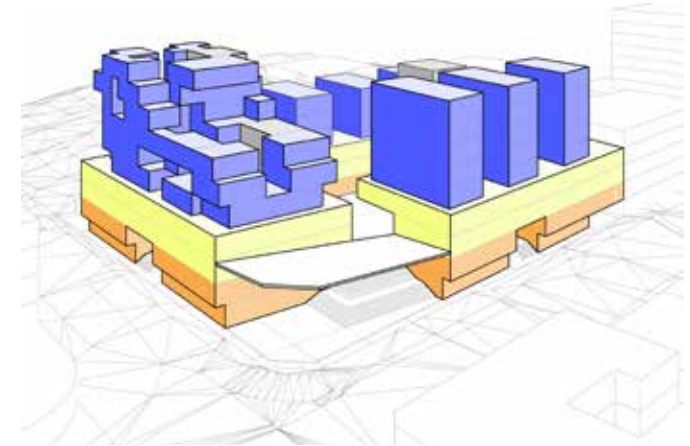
Units arrange around edge cores on one side building layout
